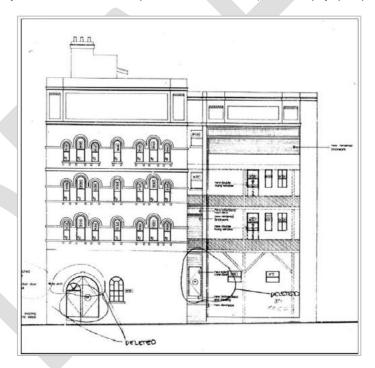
Eastern elevation of the building. The existing basement doorway was retained as existing. (Source: City of Sydney Archives 539/1/82)
